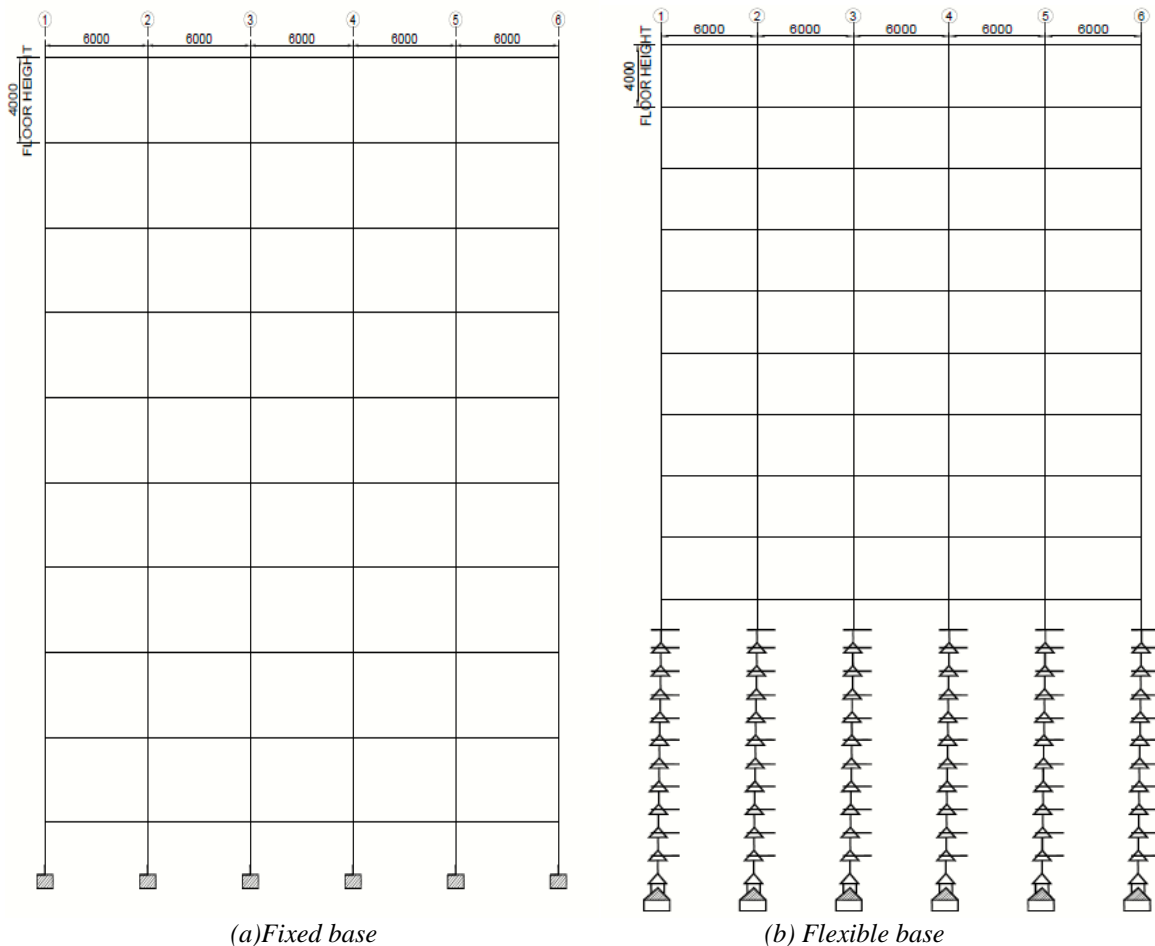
Elevation of the modelled multi-storeyed building with Pile foundation
